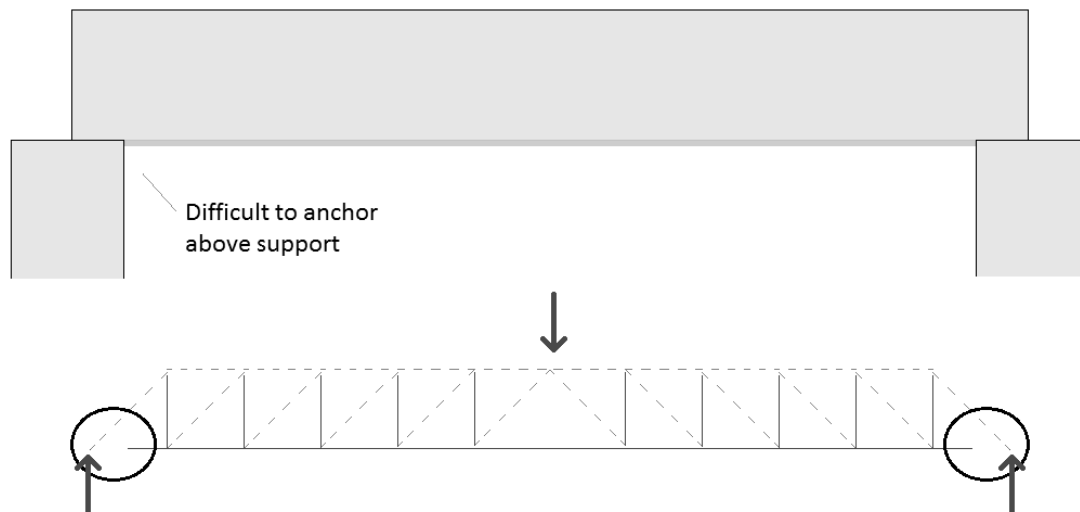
Strengthening with CFRP on the tensile side of a beam. The lack of anchorage can be seen in the lower figure.
